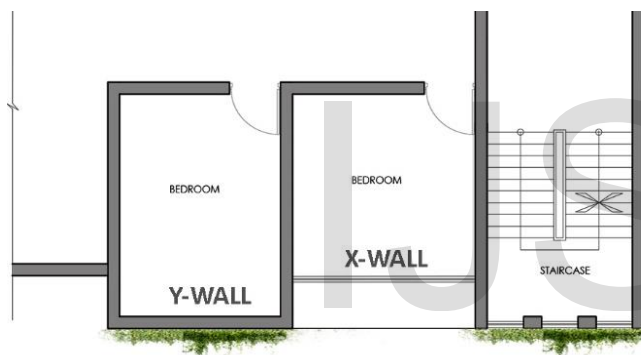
The temperature is taken in the green façade-X wall and Bare Façade-Y wall
